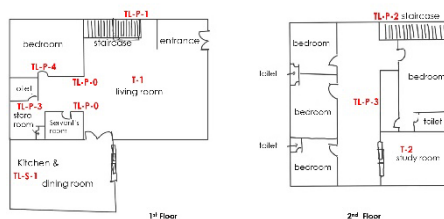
Sketch of the subject's house floor plan and sensors distribution
